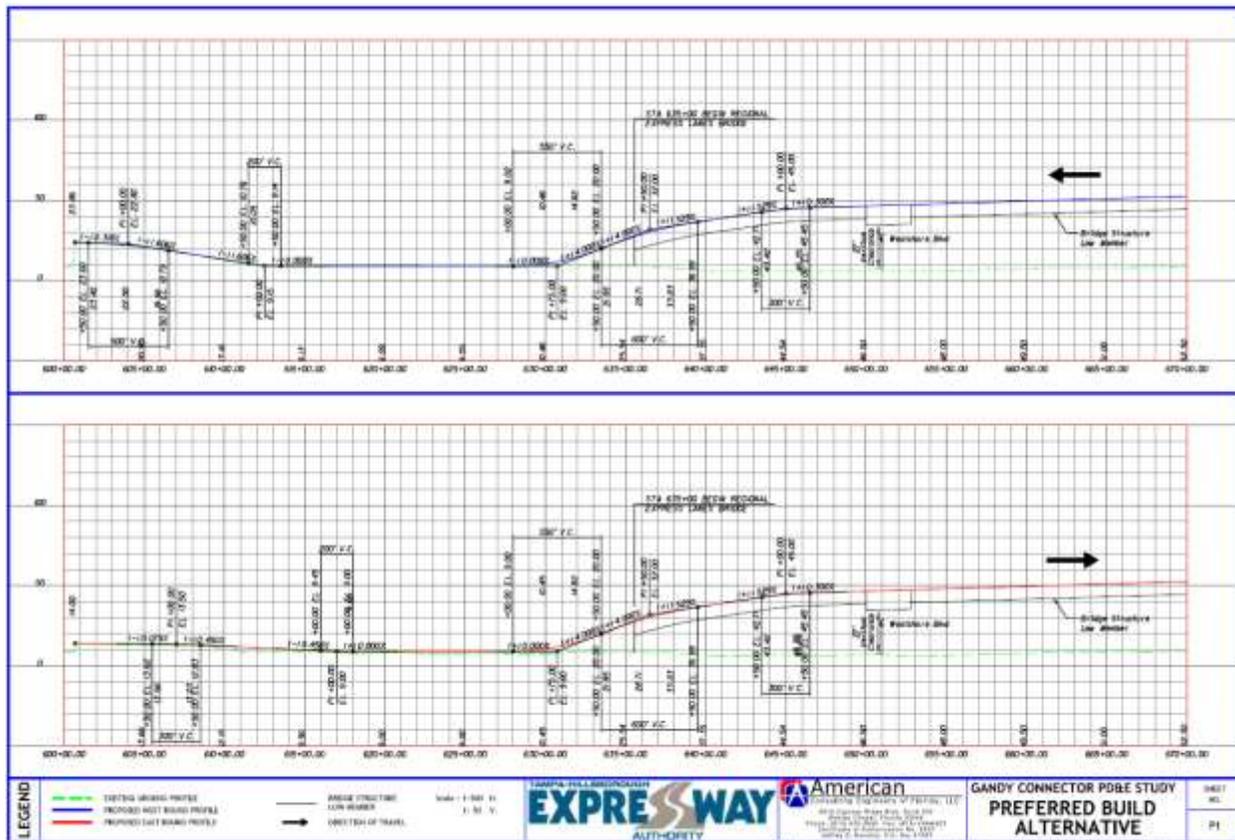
PROPOSED ROAD PROFILE³⁰
